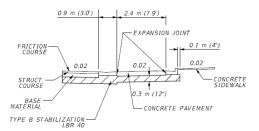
RECOMMENDED TYPICAL SECTION 2
